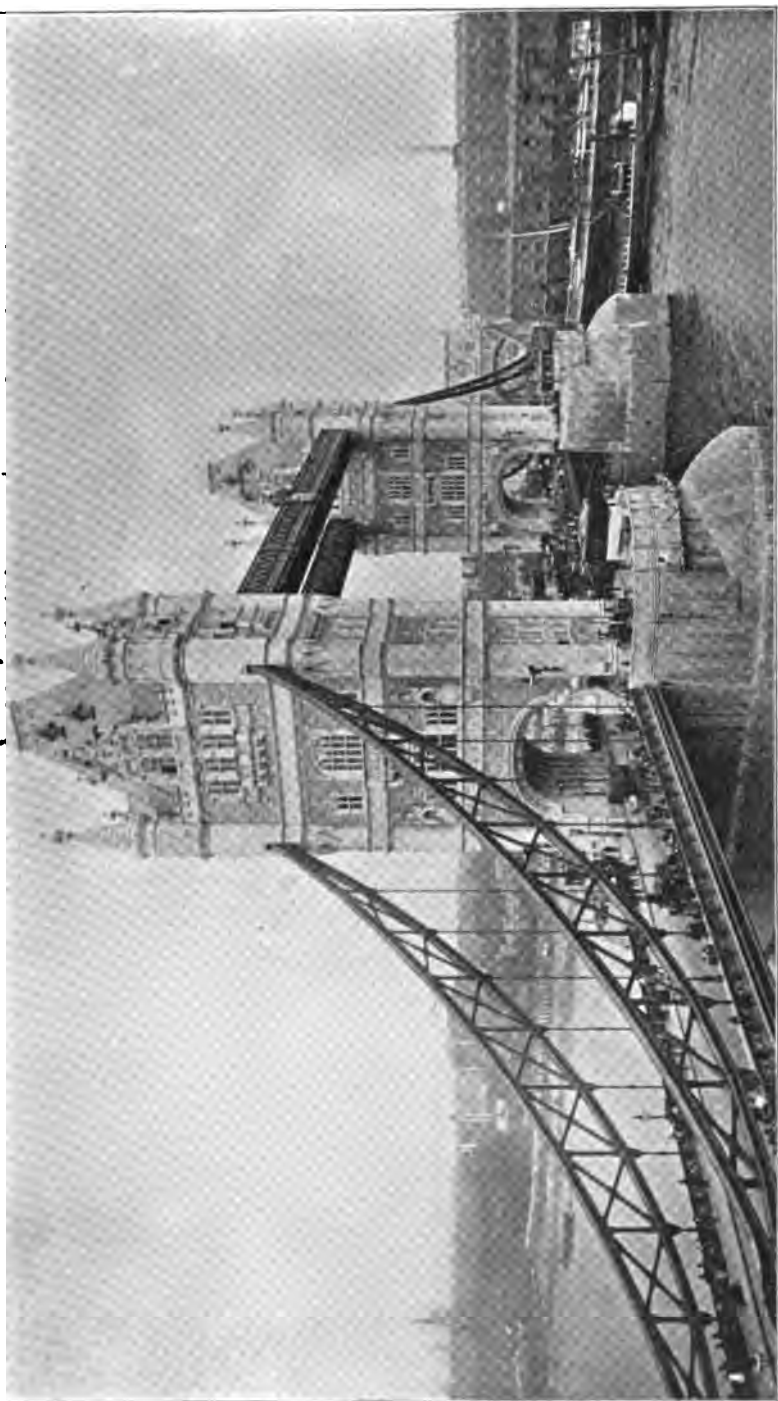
PLATE VIII.—THE TOWER BRIDGE WITH BASCULE CLOSED.
